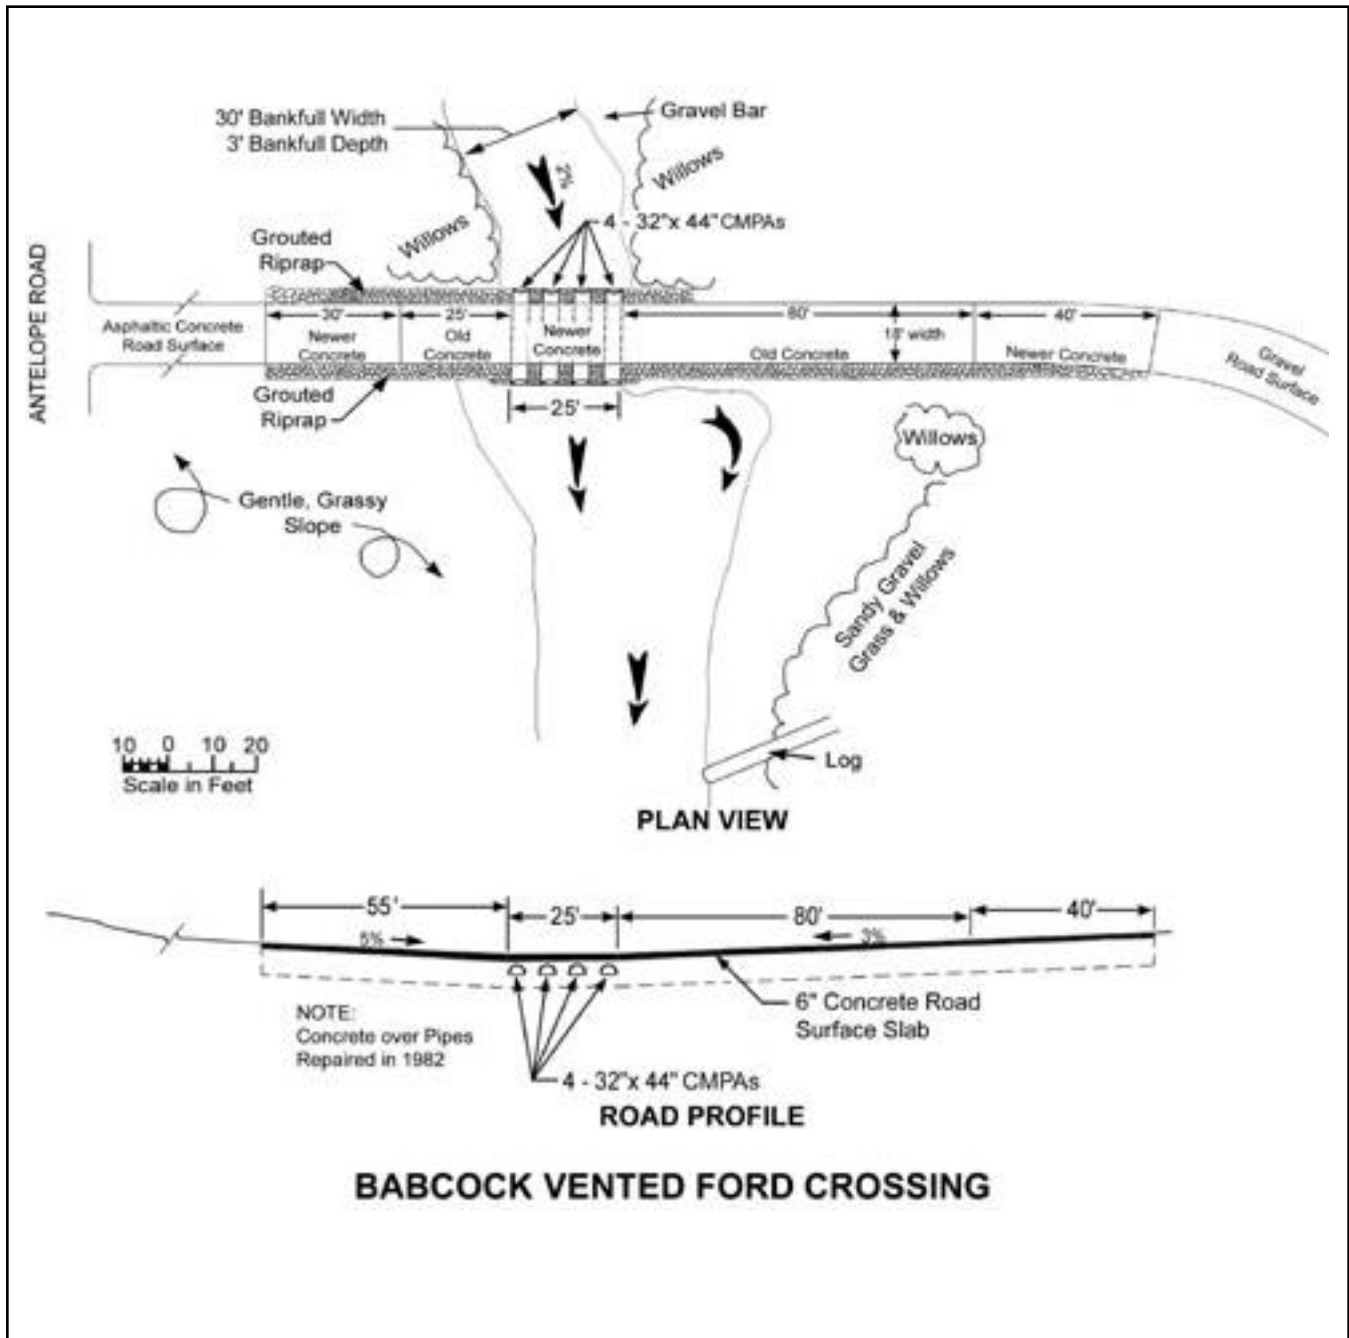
Site plan view and road cross-section sketch. Note the 5-foot deep concrete cutoff wall (dotted lines).
